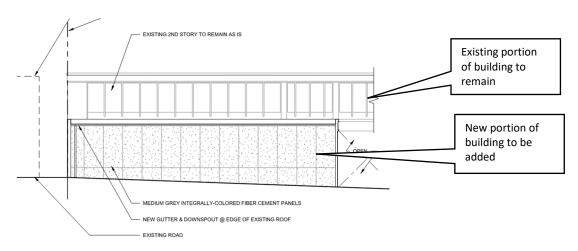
Conceptual North Façade Wall on Remodeled Off-Site Building
